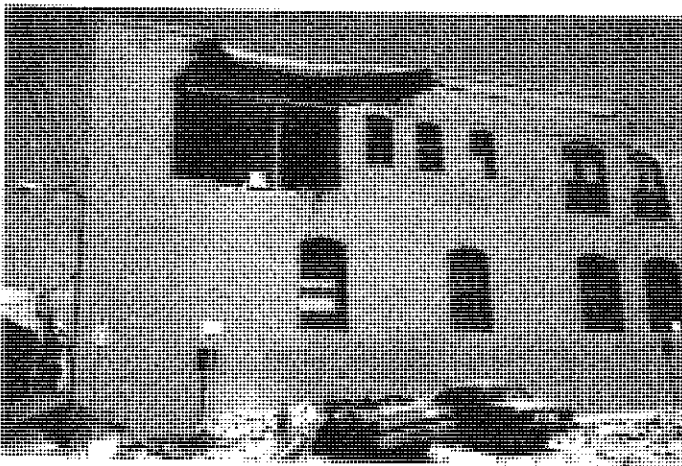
Out-of-plane wall damage to URM building. The top of the wall at the right is an imminent collapse hazard. The building was posted Unsafe and the parking lot barricaded.
